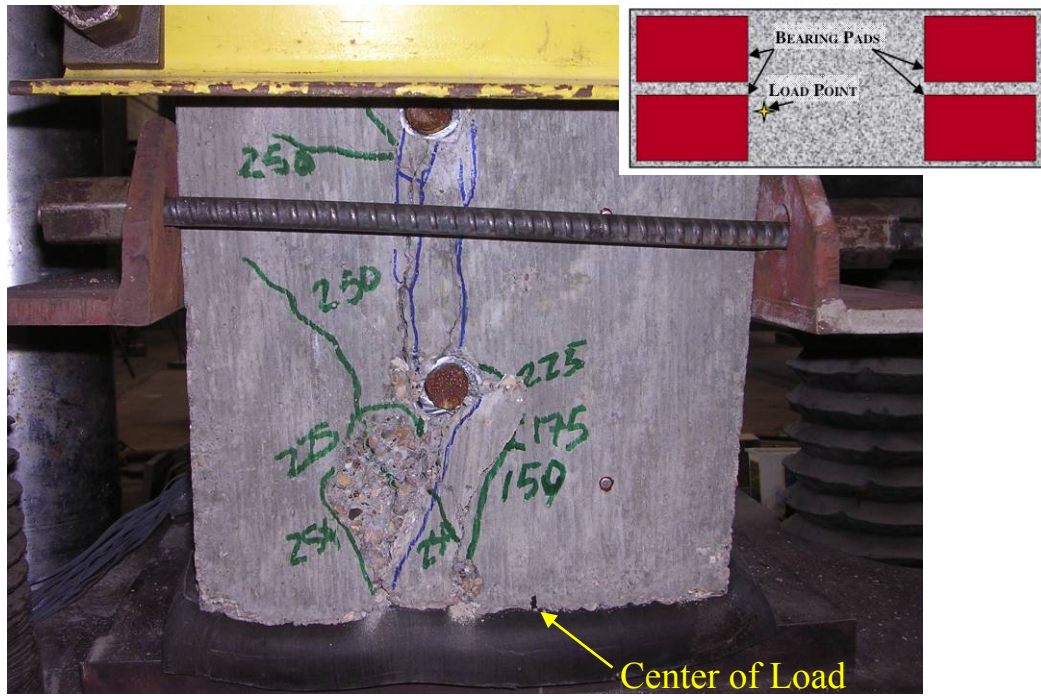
Post-tensioned #2 Specimen Short Side Crack Opening
